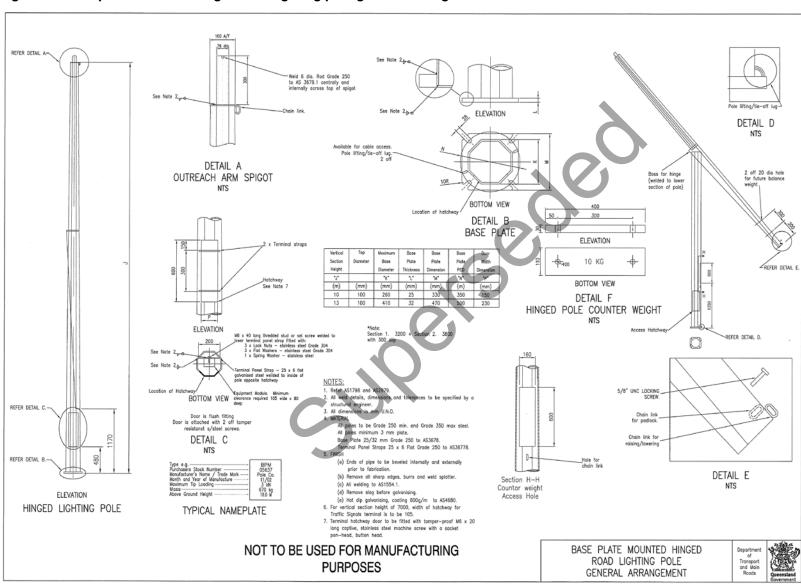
Base plate mounted hinged road lighting pole general arrangement
